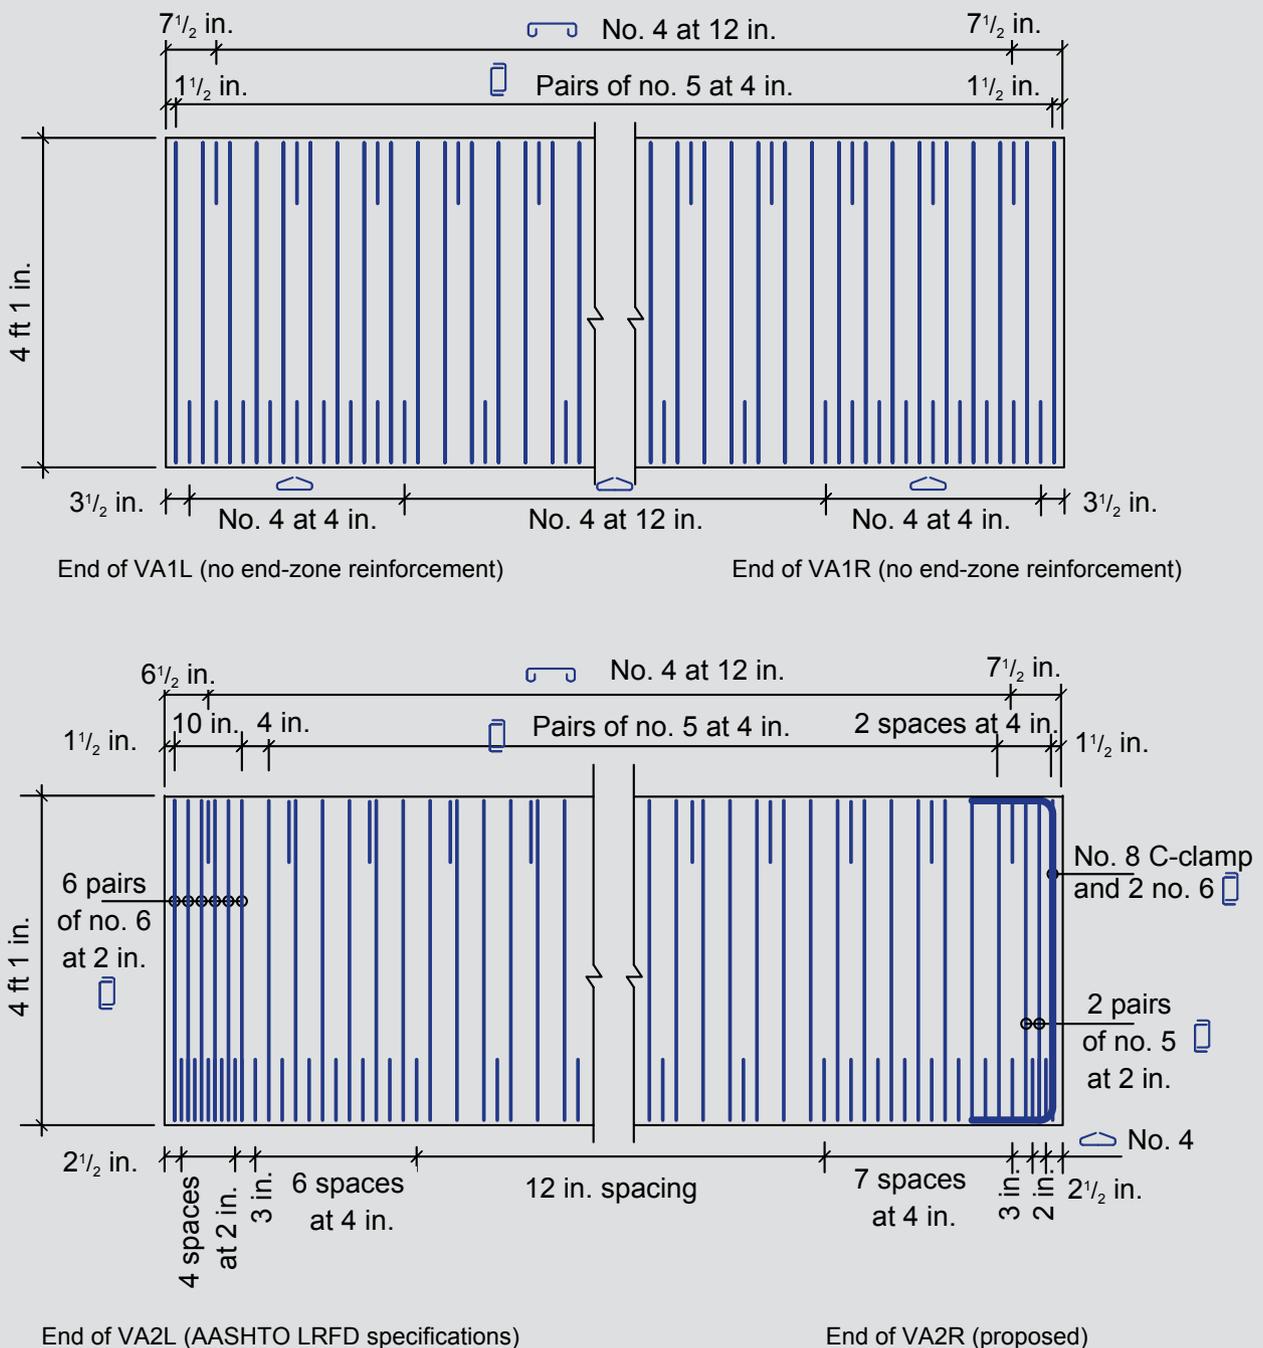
End-zone reinforcement details. Note: no. 4 = 13M; no. 5 = 16M; no. 6 = 19M; no. 8 = 25M; 1 in. = 25.4 mm; 1 ft = 0.305 m.
